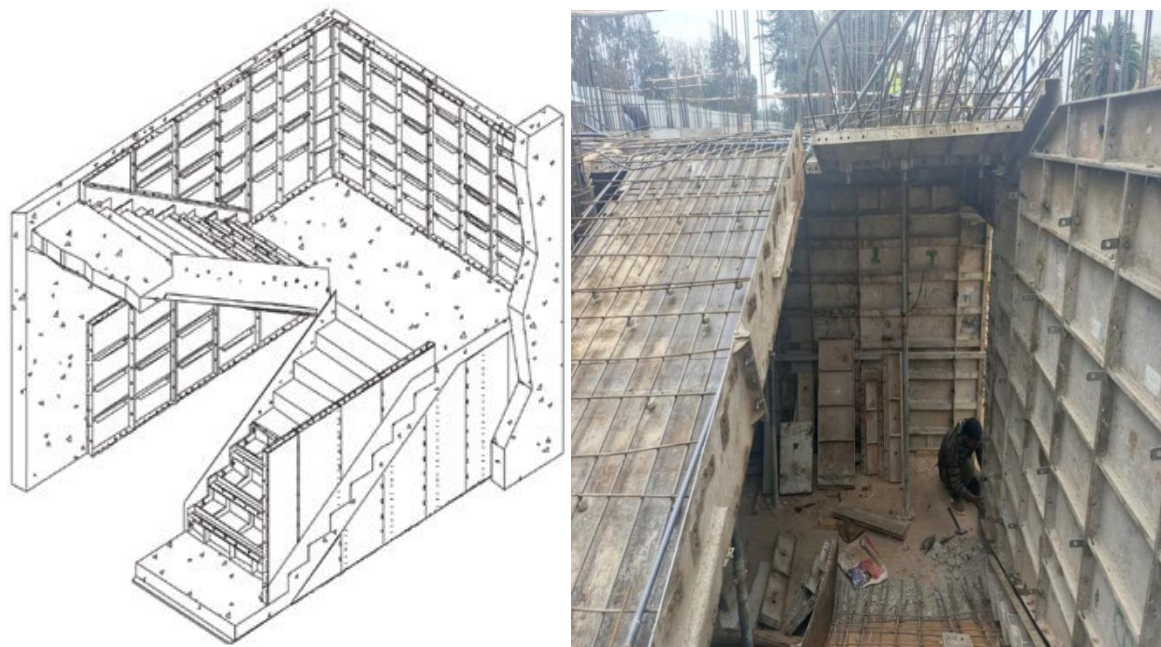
13: Staircase Panel installation mock-up and Panel installation
